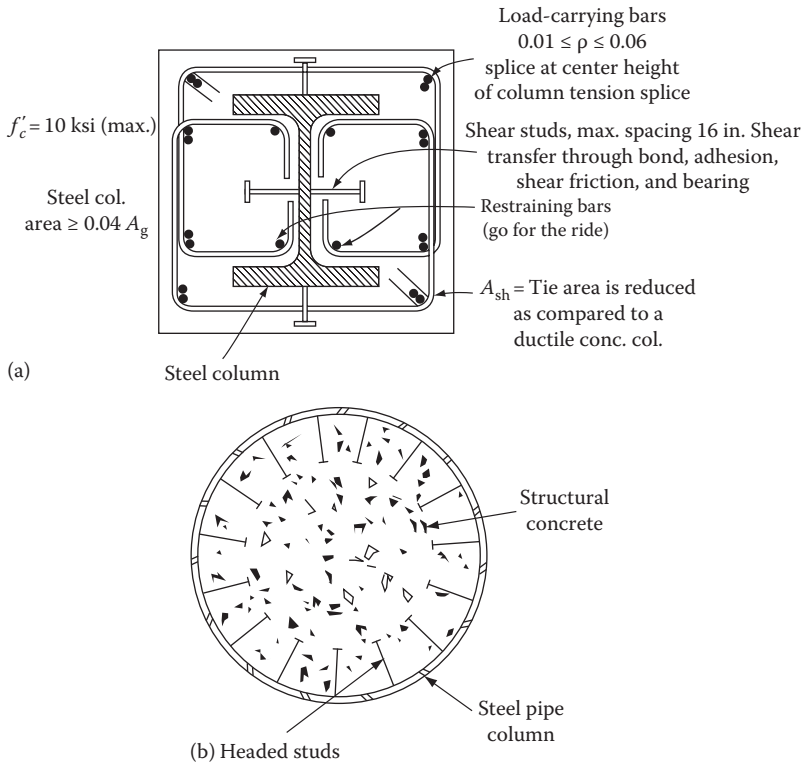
(a) Concrete encased composite column; design considerations. *Note:* Bond and adhesion must be ignored in calculating shear transfer. (b) Concrete-filled composite pipe column.
